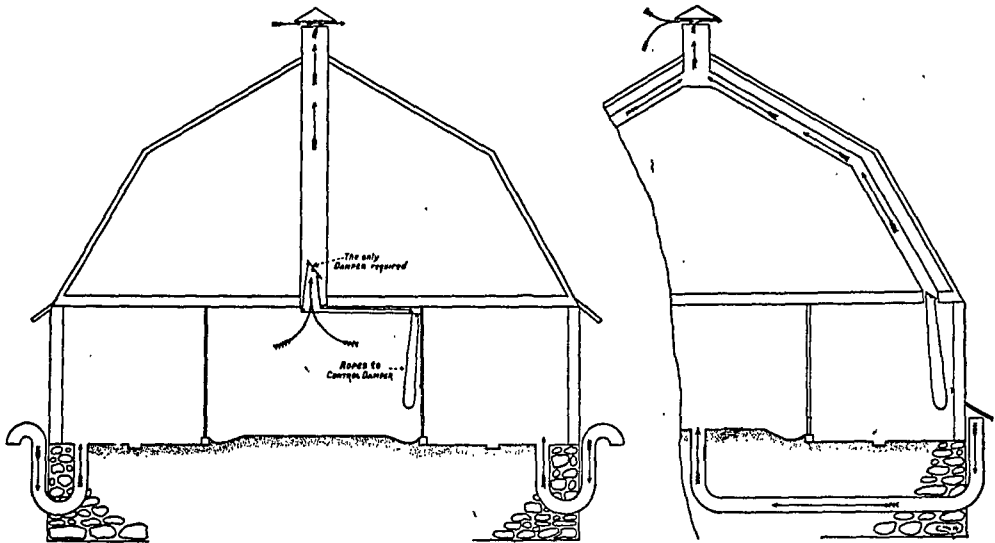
CROSS SECTION OF BARN SHOWING HOW RUTHERFORD SYSTEM MAY BE INSTALLED IN A BUILDING ALREADY CONSTRUCTED.
